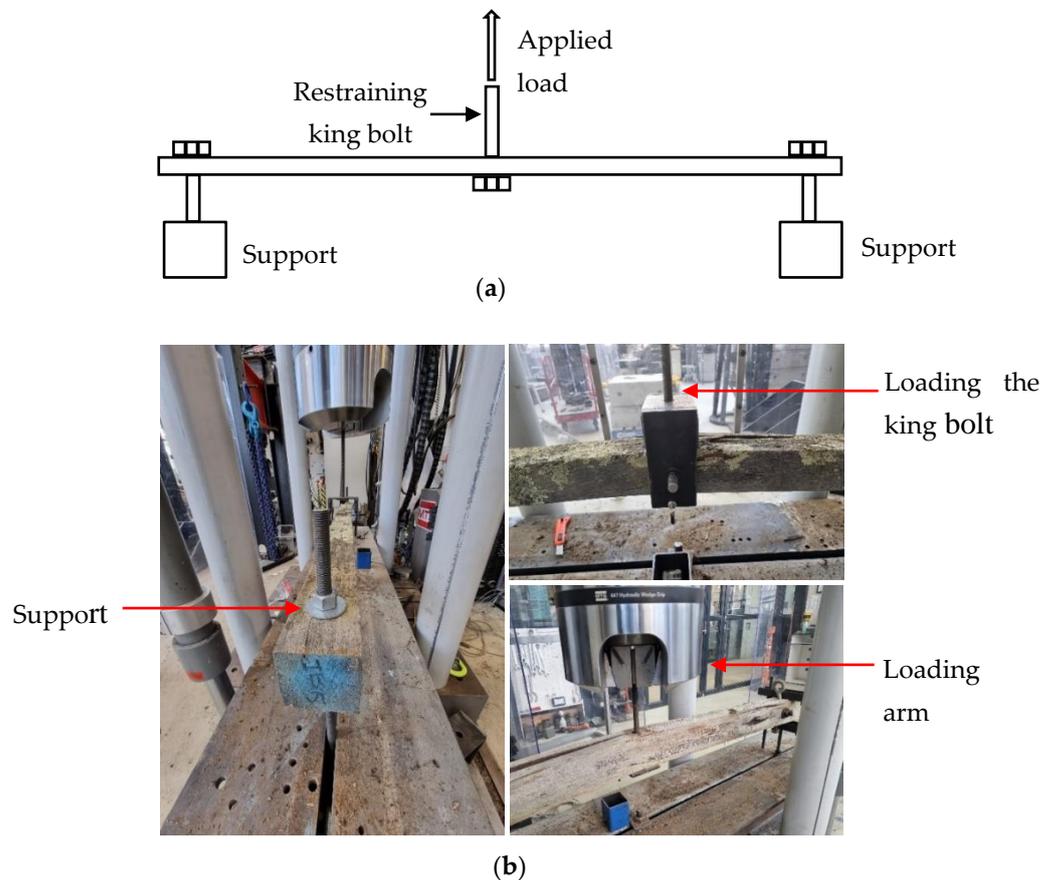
Three-point bending test setup: (a) schematic representation; (b) actual test setup.
